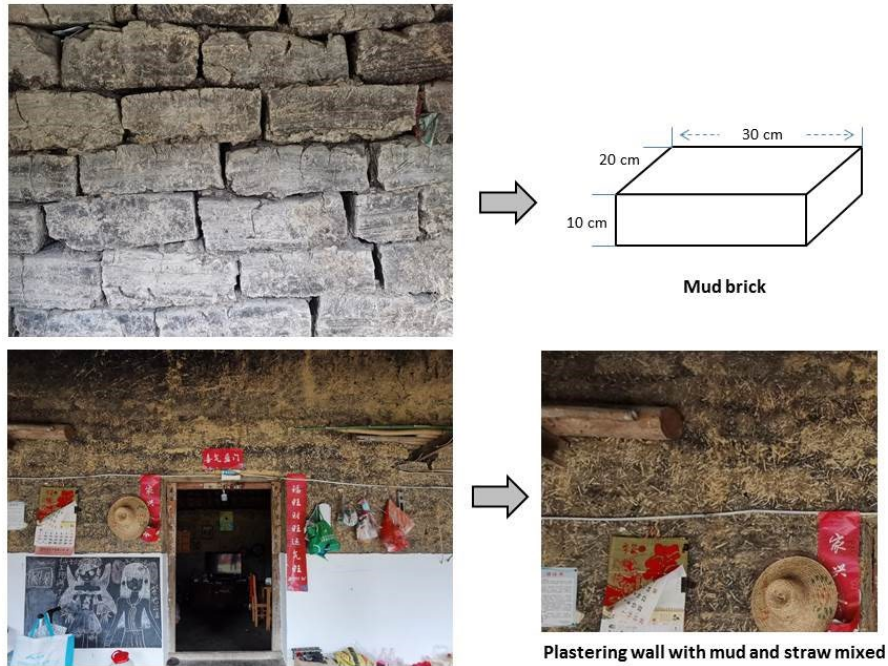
Mud brick and plastered wall of a traditional thatched cottage
